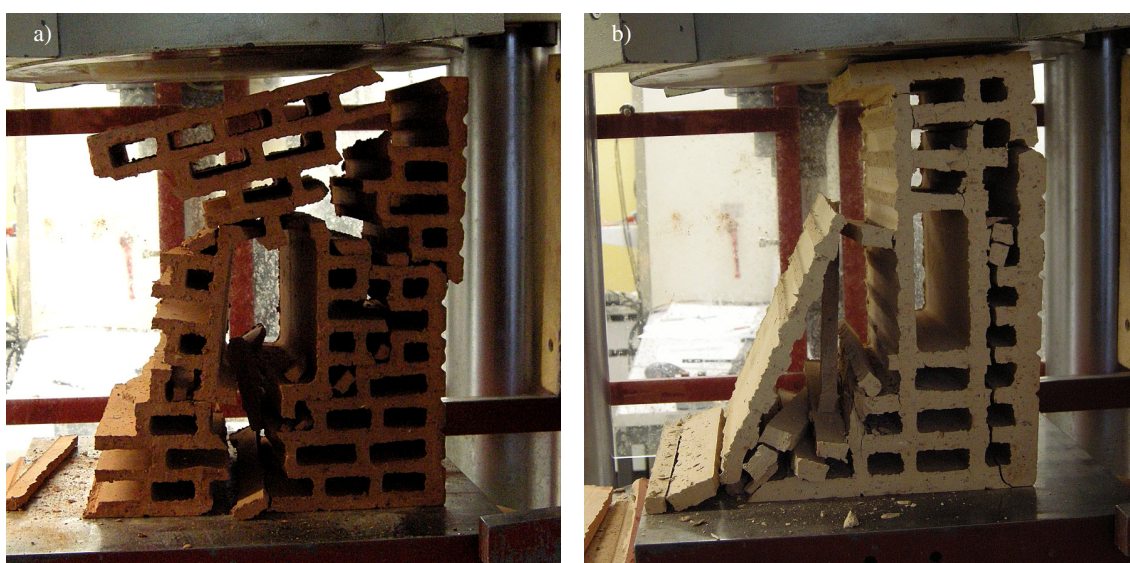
Failure modes of bricks tested in the y -direction for Brick Type 1 (a) and Brick Type 2 (b).
